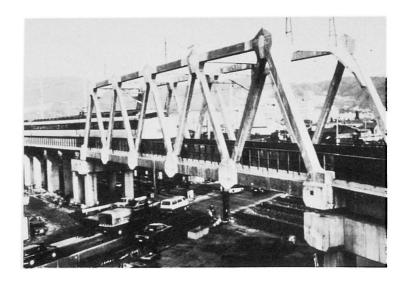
Concrete truss bridge of Sanyo super-exress line.
